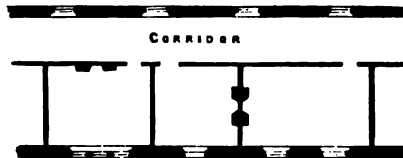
PLAN SHOWING ROOMS ENTERING FROM A CORRIDOR LIGHTED ON ONE SIDE.
